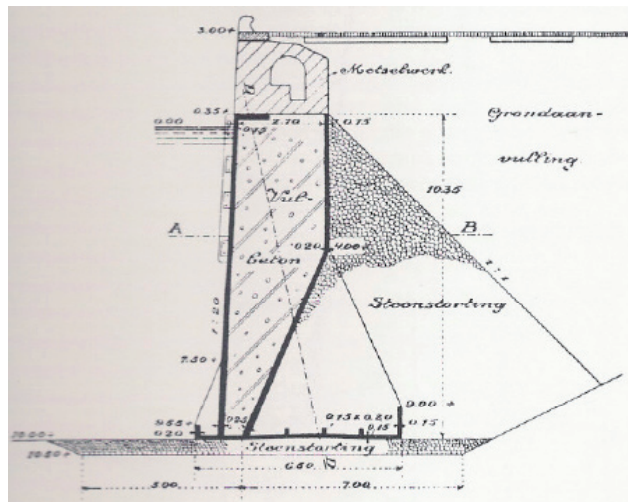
Cross-section of reinforced concrete caisson quay wall port of Valparaiso 1903 [HGB 1977]
